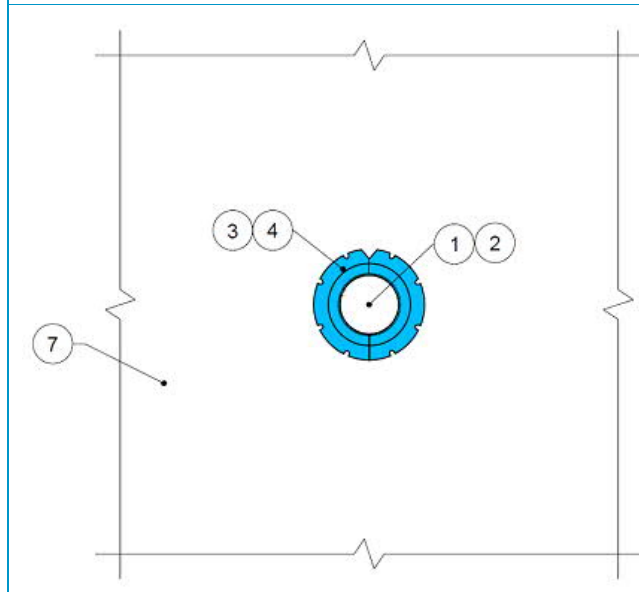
Plastic pipe with PROMASEAL® FCS 250-300 collars (floor underside plan view)
